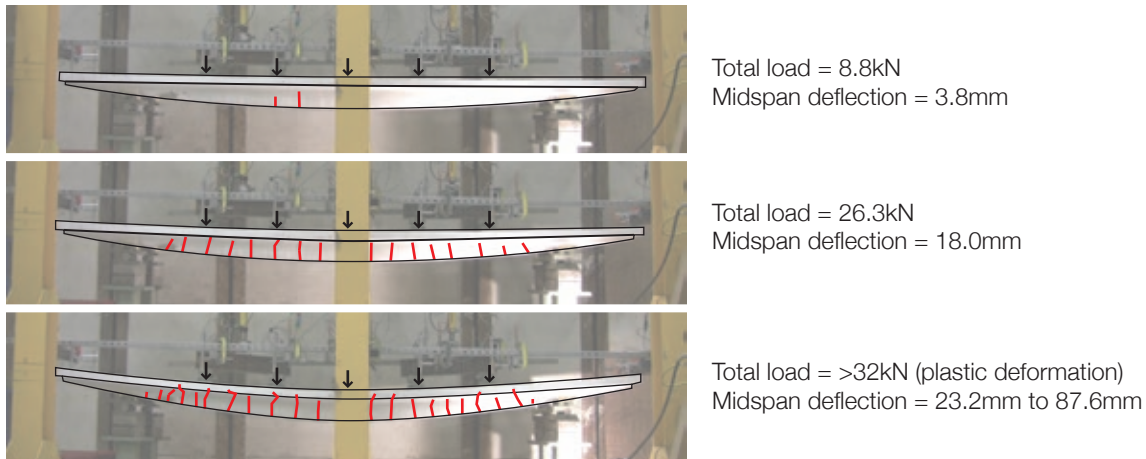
Cracking and failure mode for Beam 6\_4\_1.
